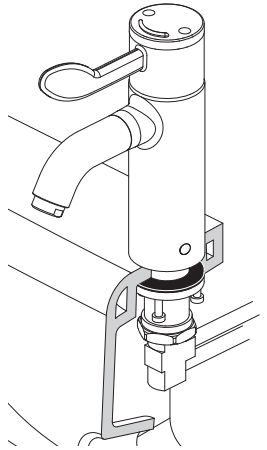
Example of mixer mounted in a centre tap hole in a closed wash basin
